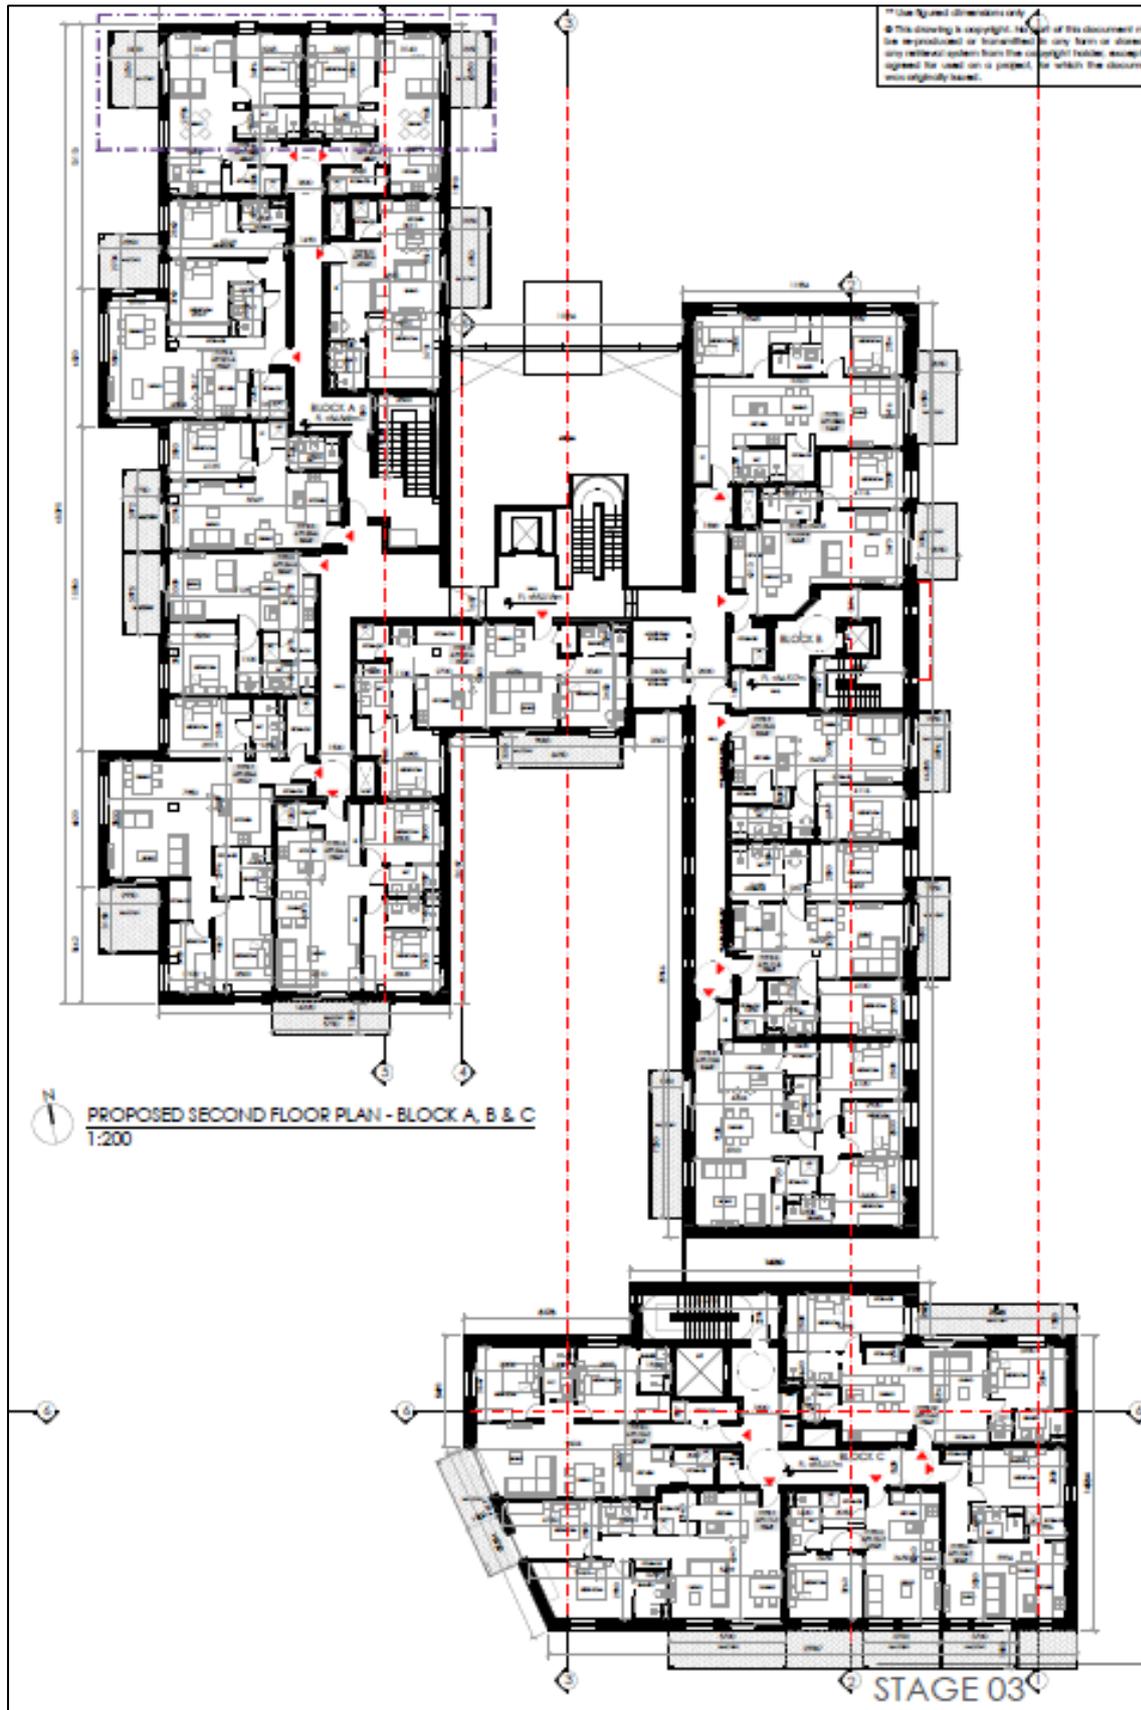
Second floor plan of the proposed Blocks A, B and C
